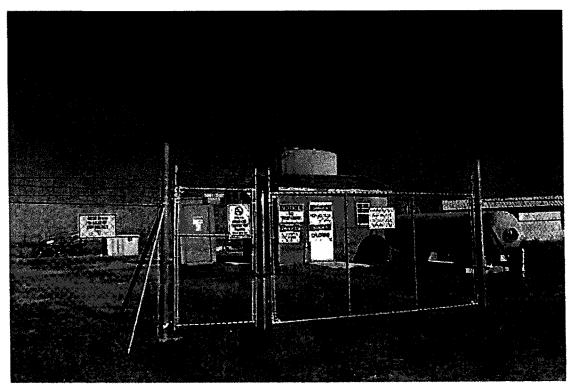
Sample Station No. 2 Located on Meadow Vista Circle
